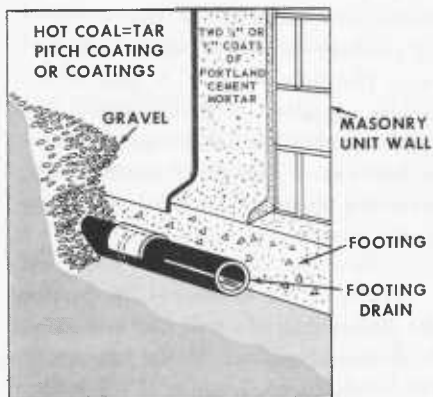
A footing drain prevents the accumulation of water around basement walls.
